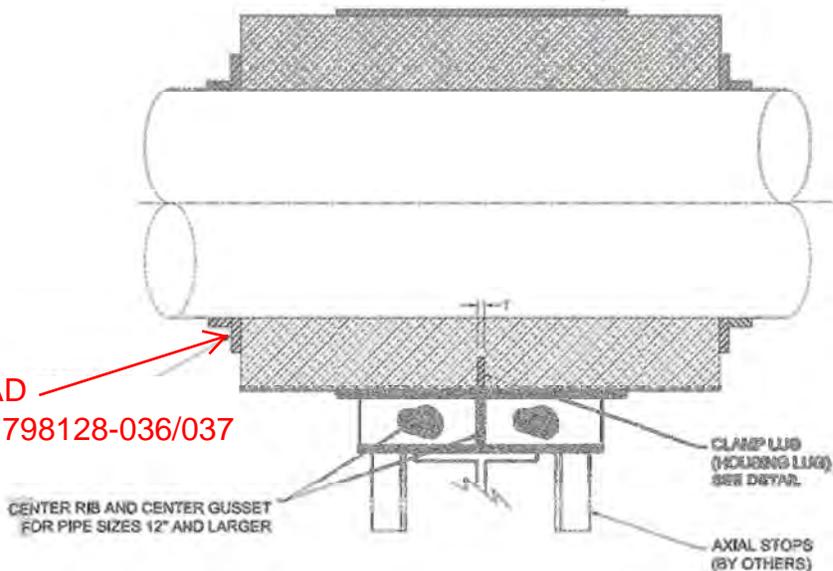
Axial Pipe Lug Detail (ANCHORS ONLY)
